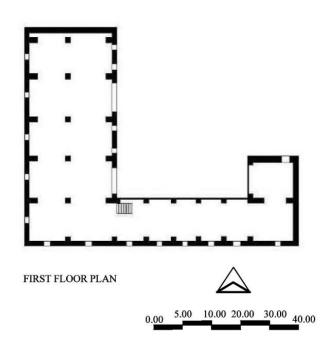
The first floor plan of Fincancioğlu Soap Factory, Nizip (Source: Eker, 2006)
